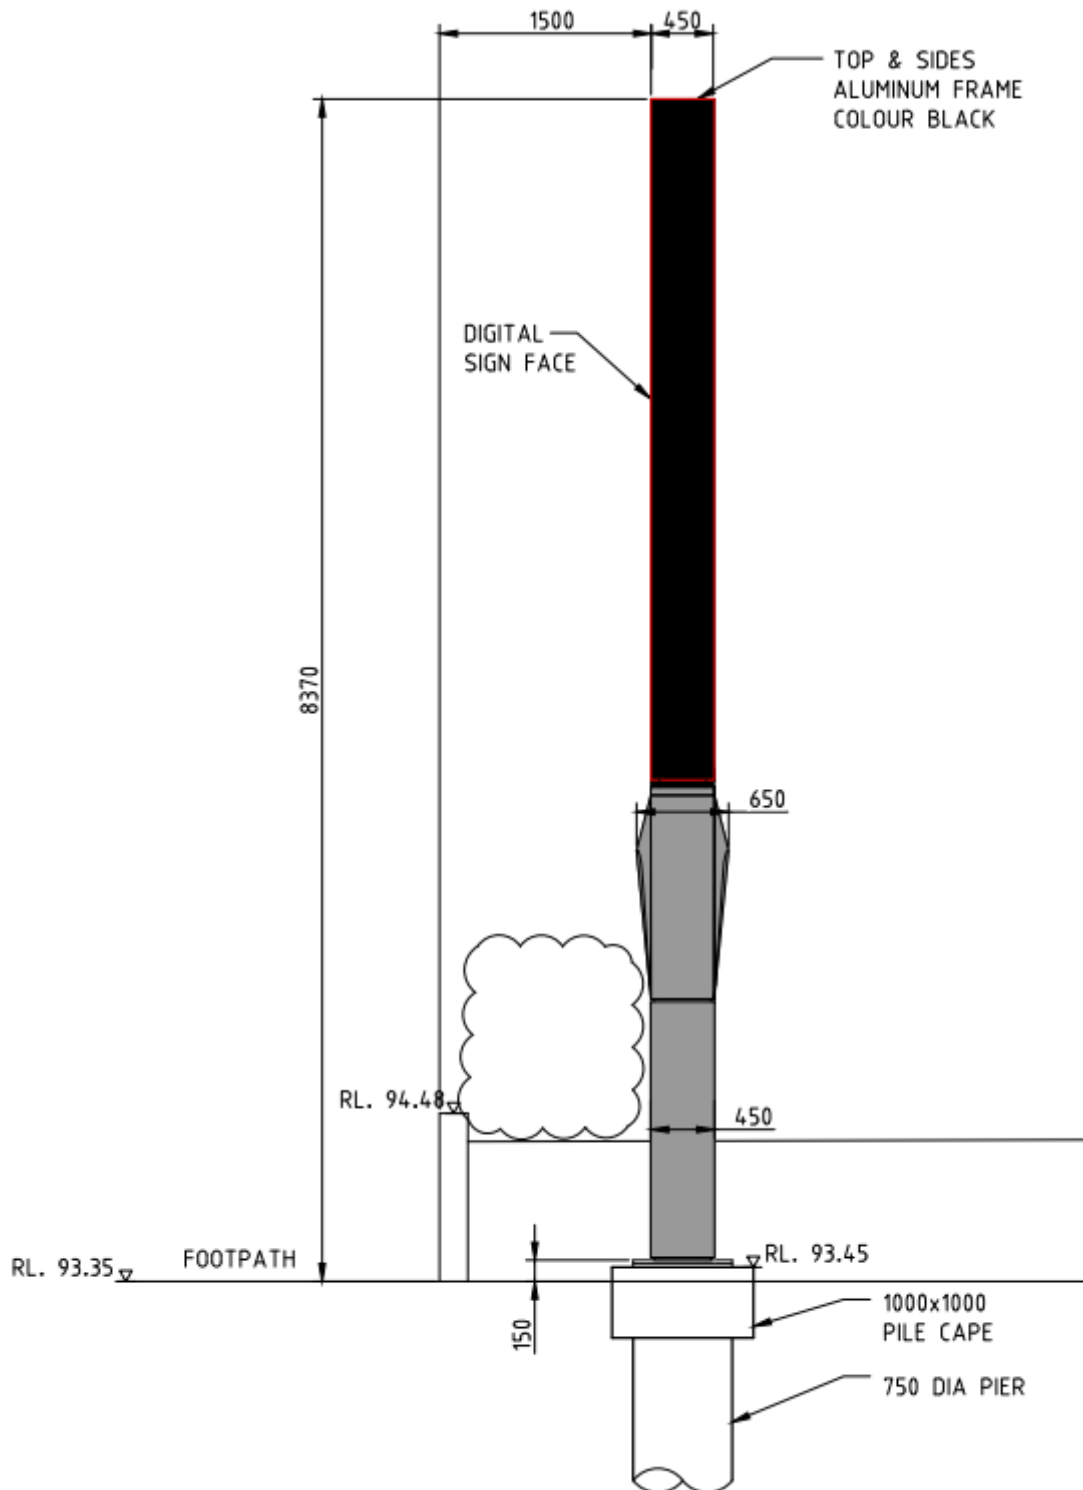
Side elevation of proposed sign (Source: Dennis Bunt Consulting Engineers)
